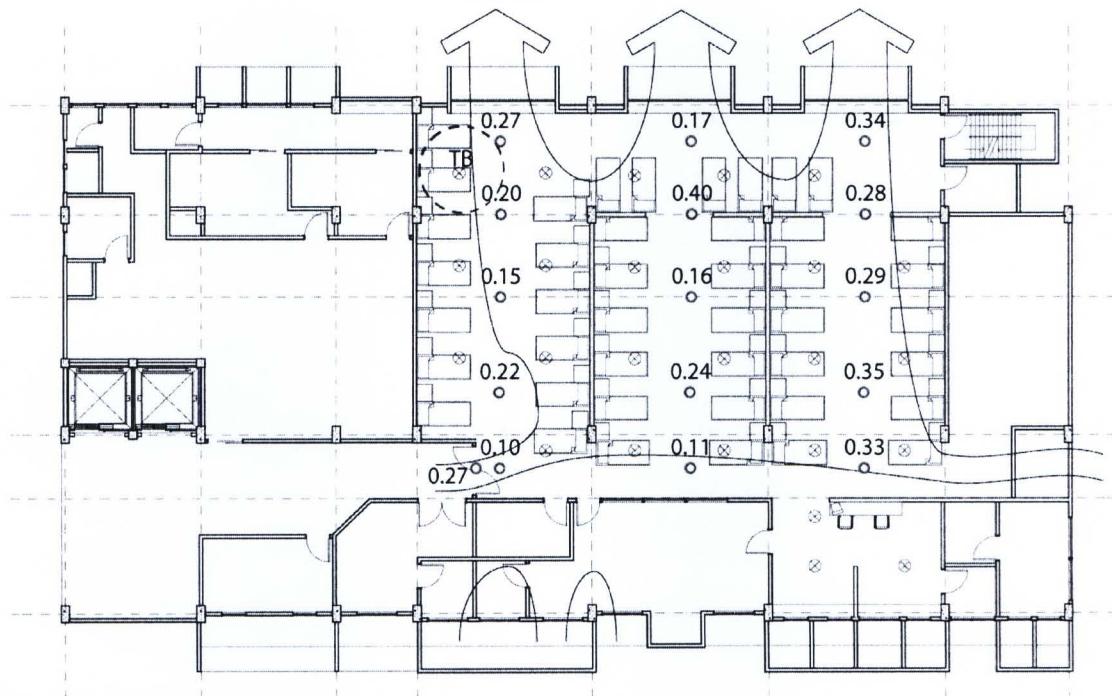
Floor plan and ventilation data of hospital D inpatient ward#2
